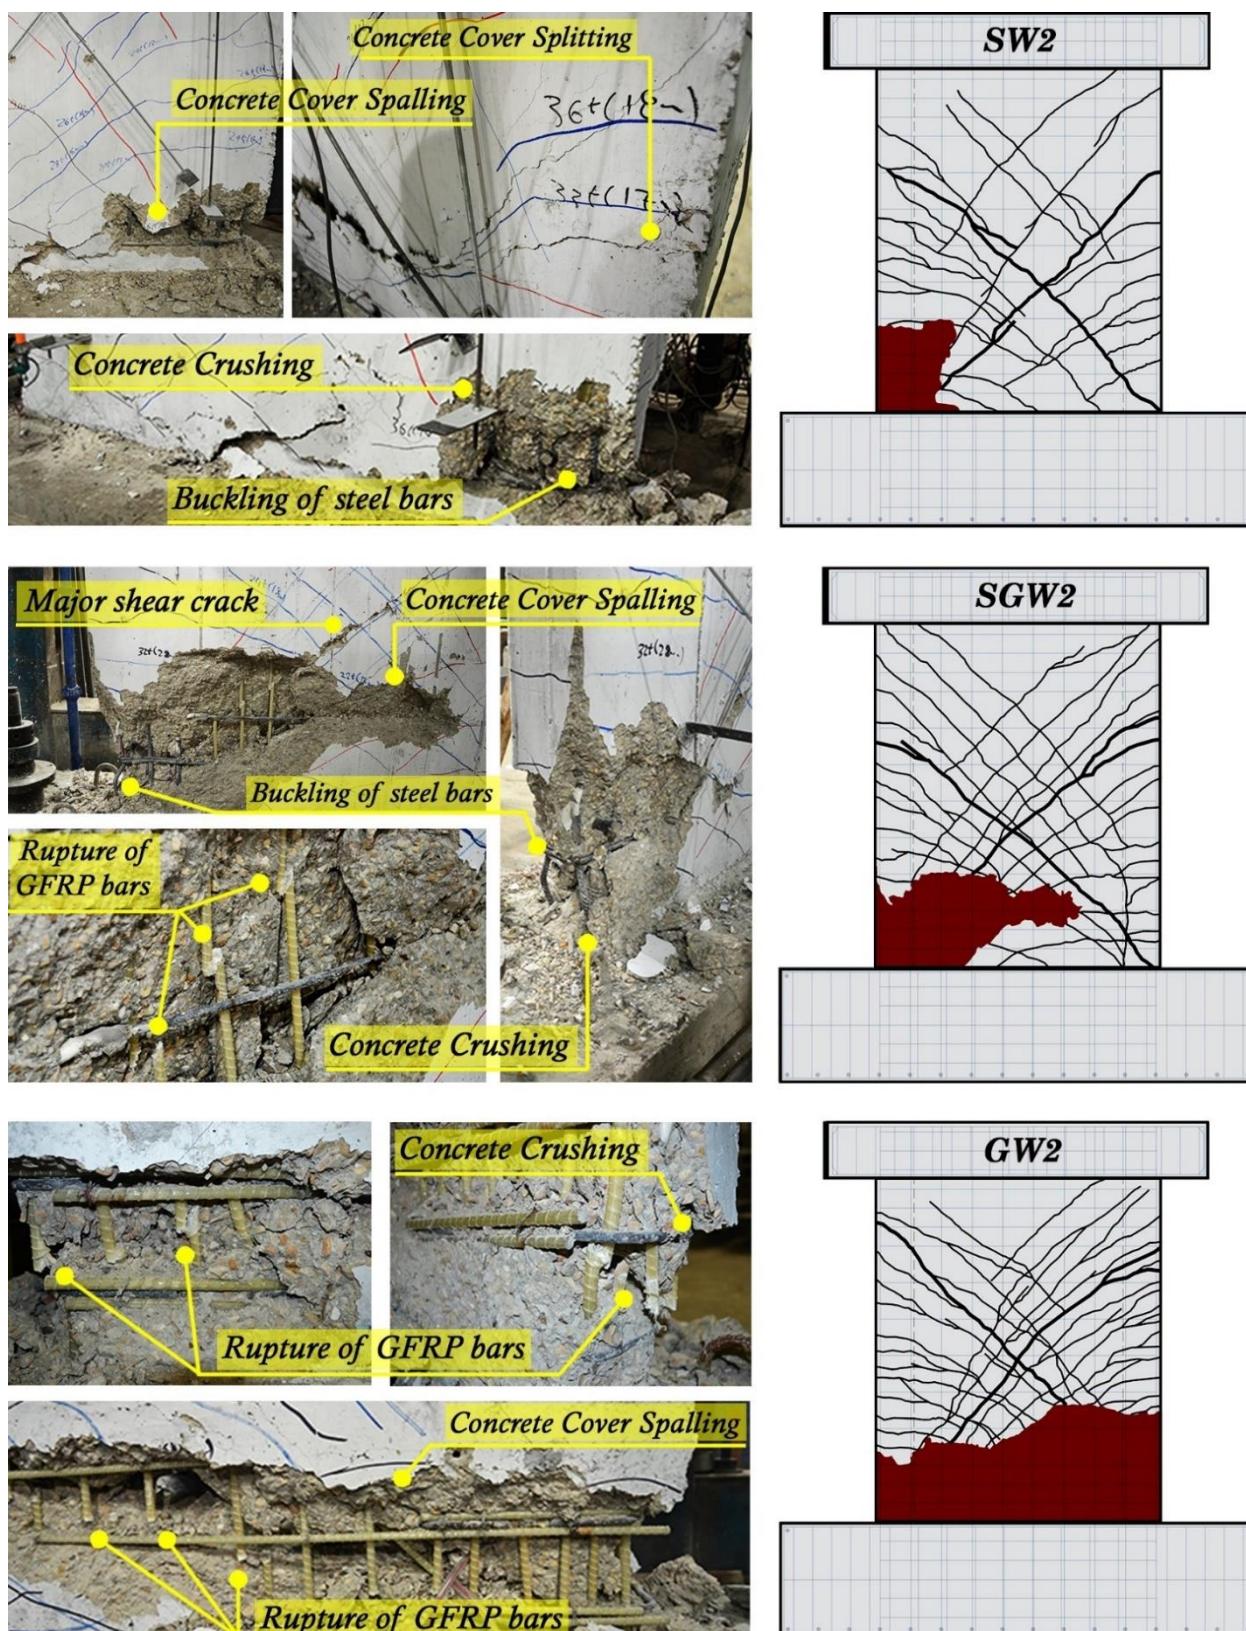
Crack patterns and damage observed at failure of walls SW2, SGW2 and GW2
